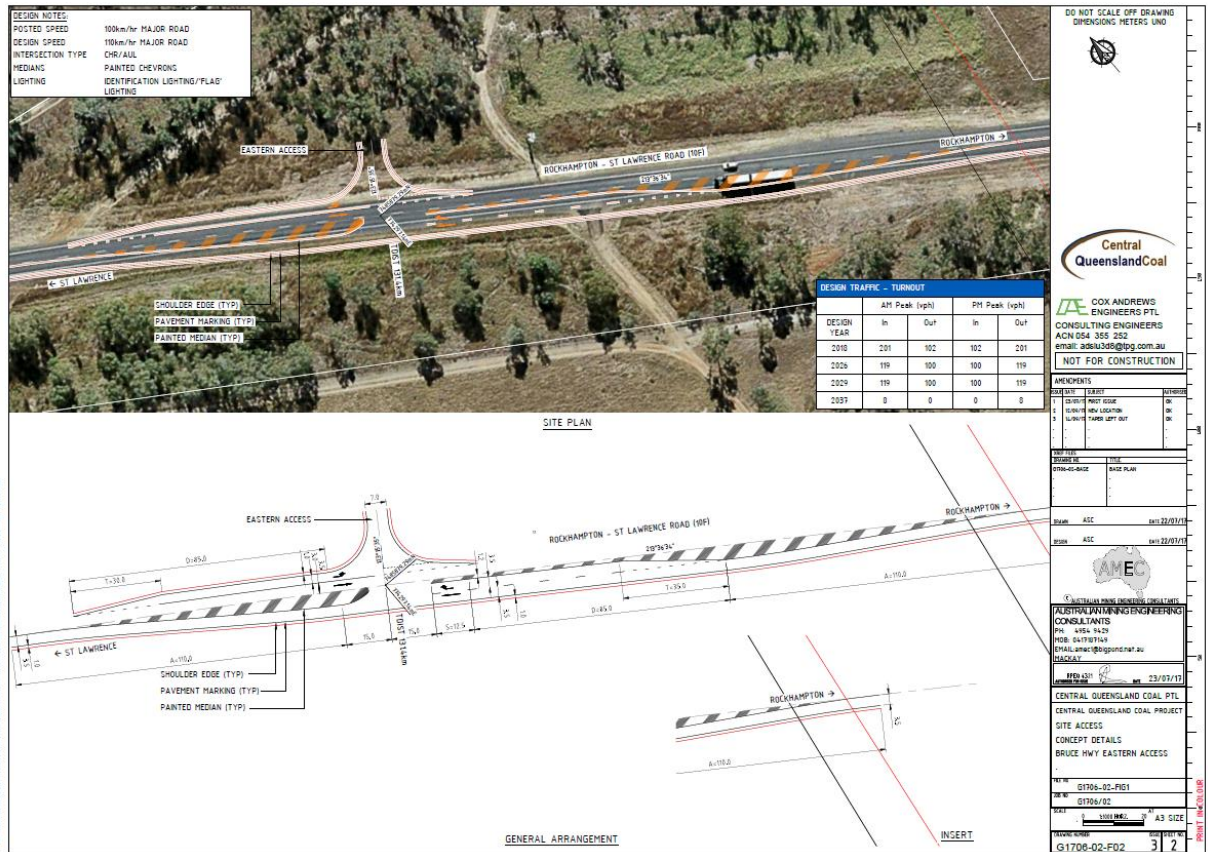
Revised site access concept details Bruce Highway eastern access
